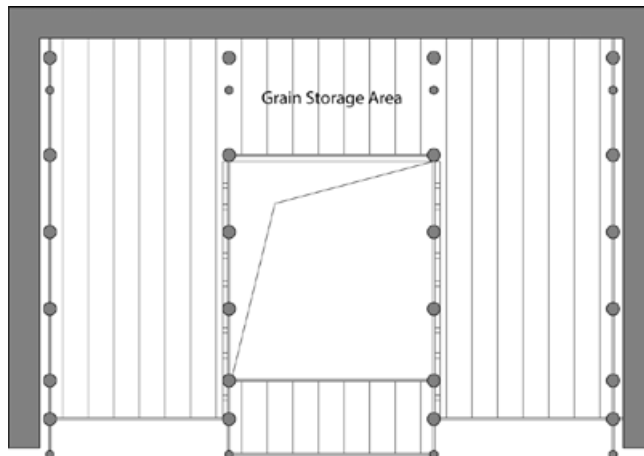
Upper floor is covered by a roof. This floor is well shaded and has good ventilation. Dwellers store grains on the wooden floor. (Source: Author)
